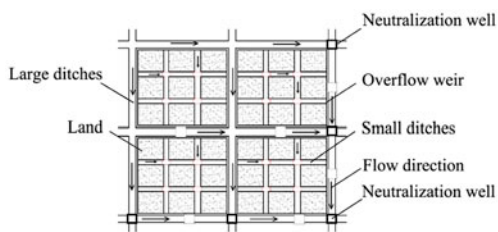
Layout I trapezoidal terrace land: Setup of neutralization well at the intersection of the ditches.
